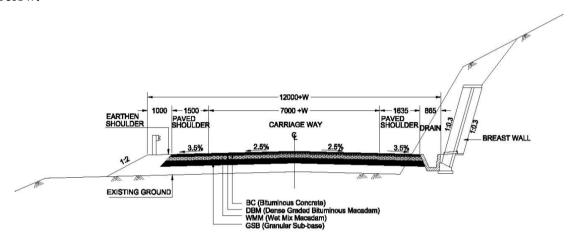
(1): Typical Cross Section for Widening Primarily to Hill Side
